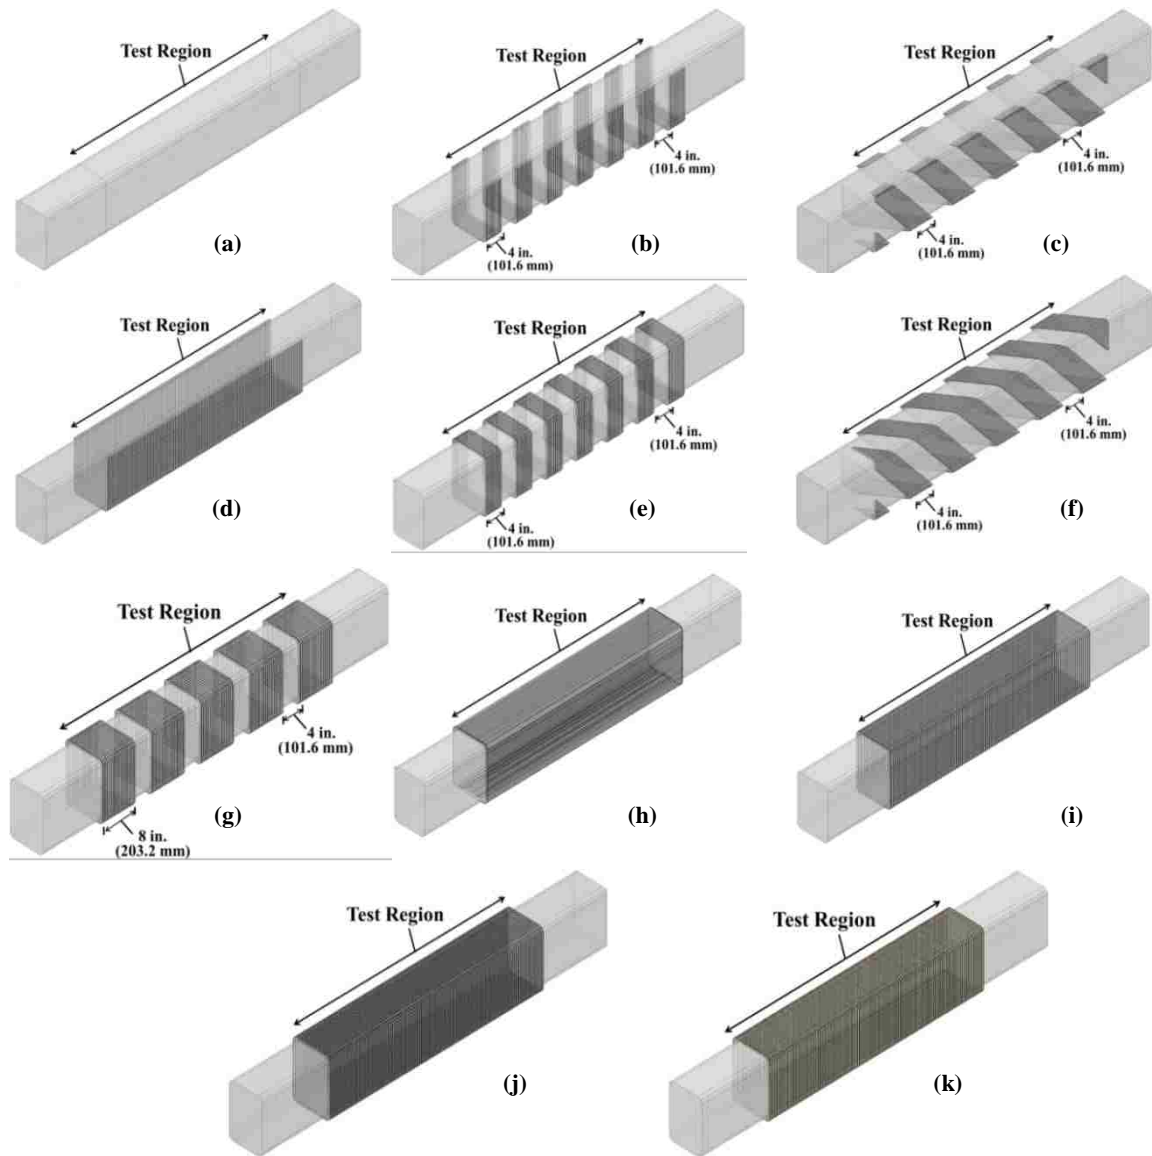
Schematic configuration of the RC beams: a) control beam, b) one layer, 3-sided, 90° , strips (N-P-3-S-1), c) one layer, 3-sided, 45° , strips (N-P-3-45S-1), d) one layer, 3-sided, 90° , continuous (N-P-3-C-1), e) one layer, 4-sided, 90° , strips (N-P-4-S-1), f) one layer, 4-sided, 45° , strips (N-P-4-45S-1), g) one layer, 4-sided, 90° , strips (N-P-4-8S-1), h) one layer, 4-sided, 0° , continuous (N-P-4-0C-1), i) one layer, 4-sided, 90° , continuous (N-P-4-C-1), j) two layers, 4-sided, $0^\circ/90^\circ$, continuous (N-P-4-0/90C-2), k) two layers, 4-sided, 90° , continuous (N-P-4-C-2).
